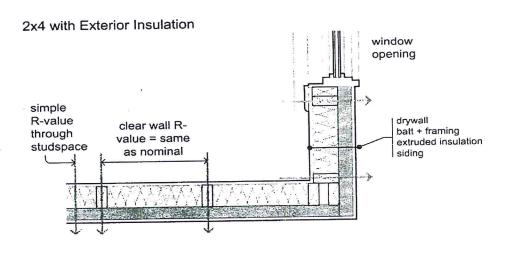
The effect of external continuous insulation over an insulated stud wall.
